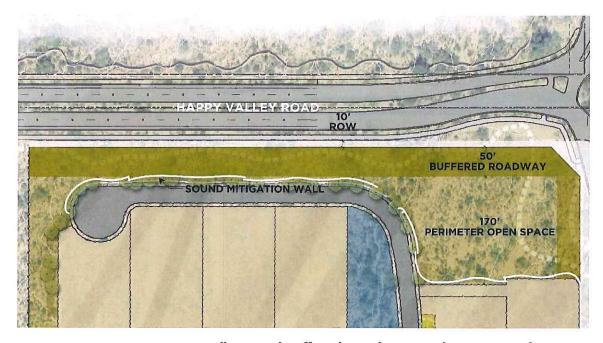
Happy Valley Road Buffered Roadway Landscape Corridor
